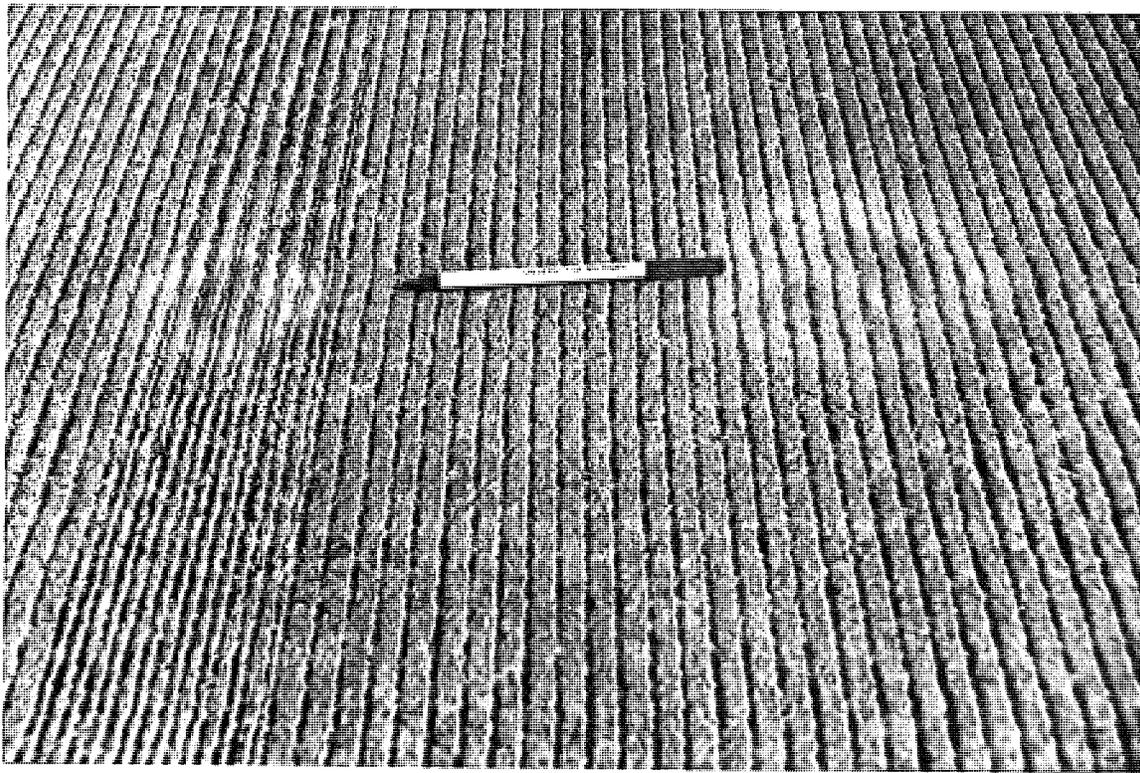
A tight transverse crack on CSN# 19042-24680A (Section B) EB, typical of those seen in the test section.
